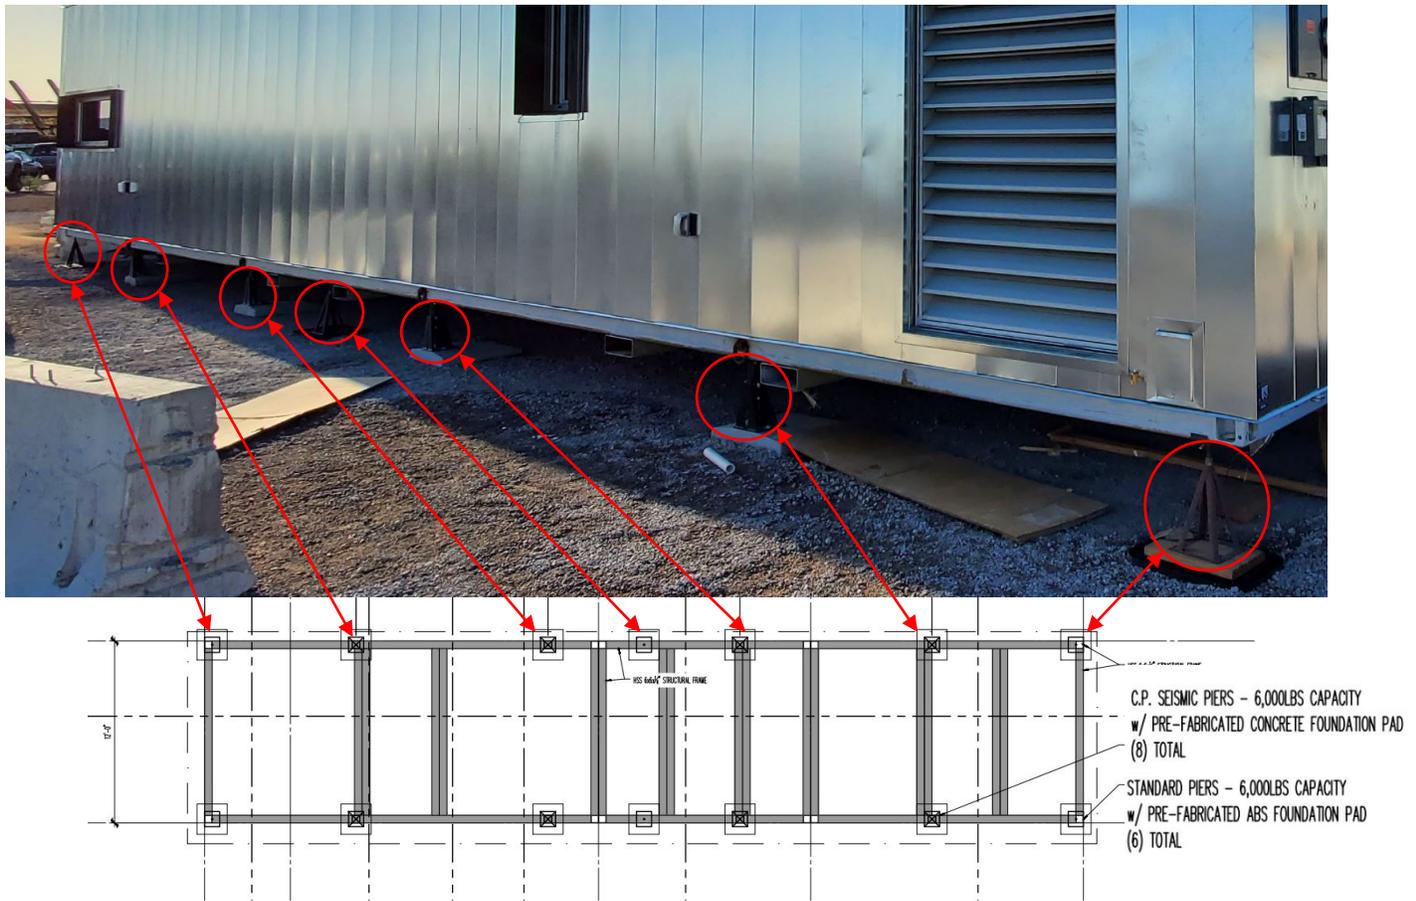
C.P. Seismic/Standard Piers supporting the modular house
